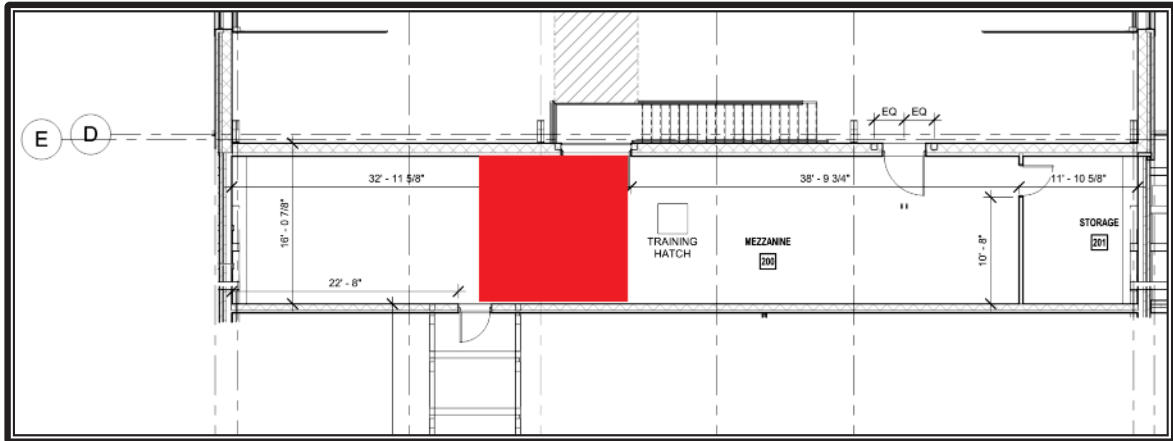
Partial plan of the building showing the approximate location of the one (1) levelness and flatness testing area at the mezzanine elevated slab (shaded) (cropped plan courtesy of SCNA).
